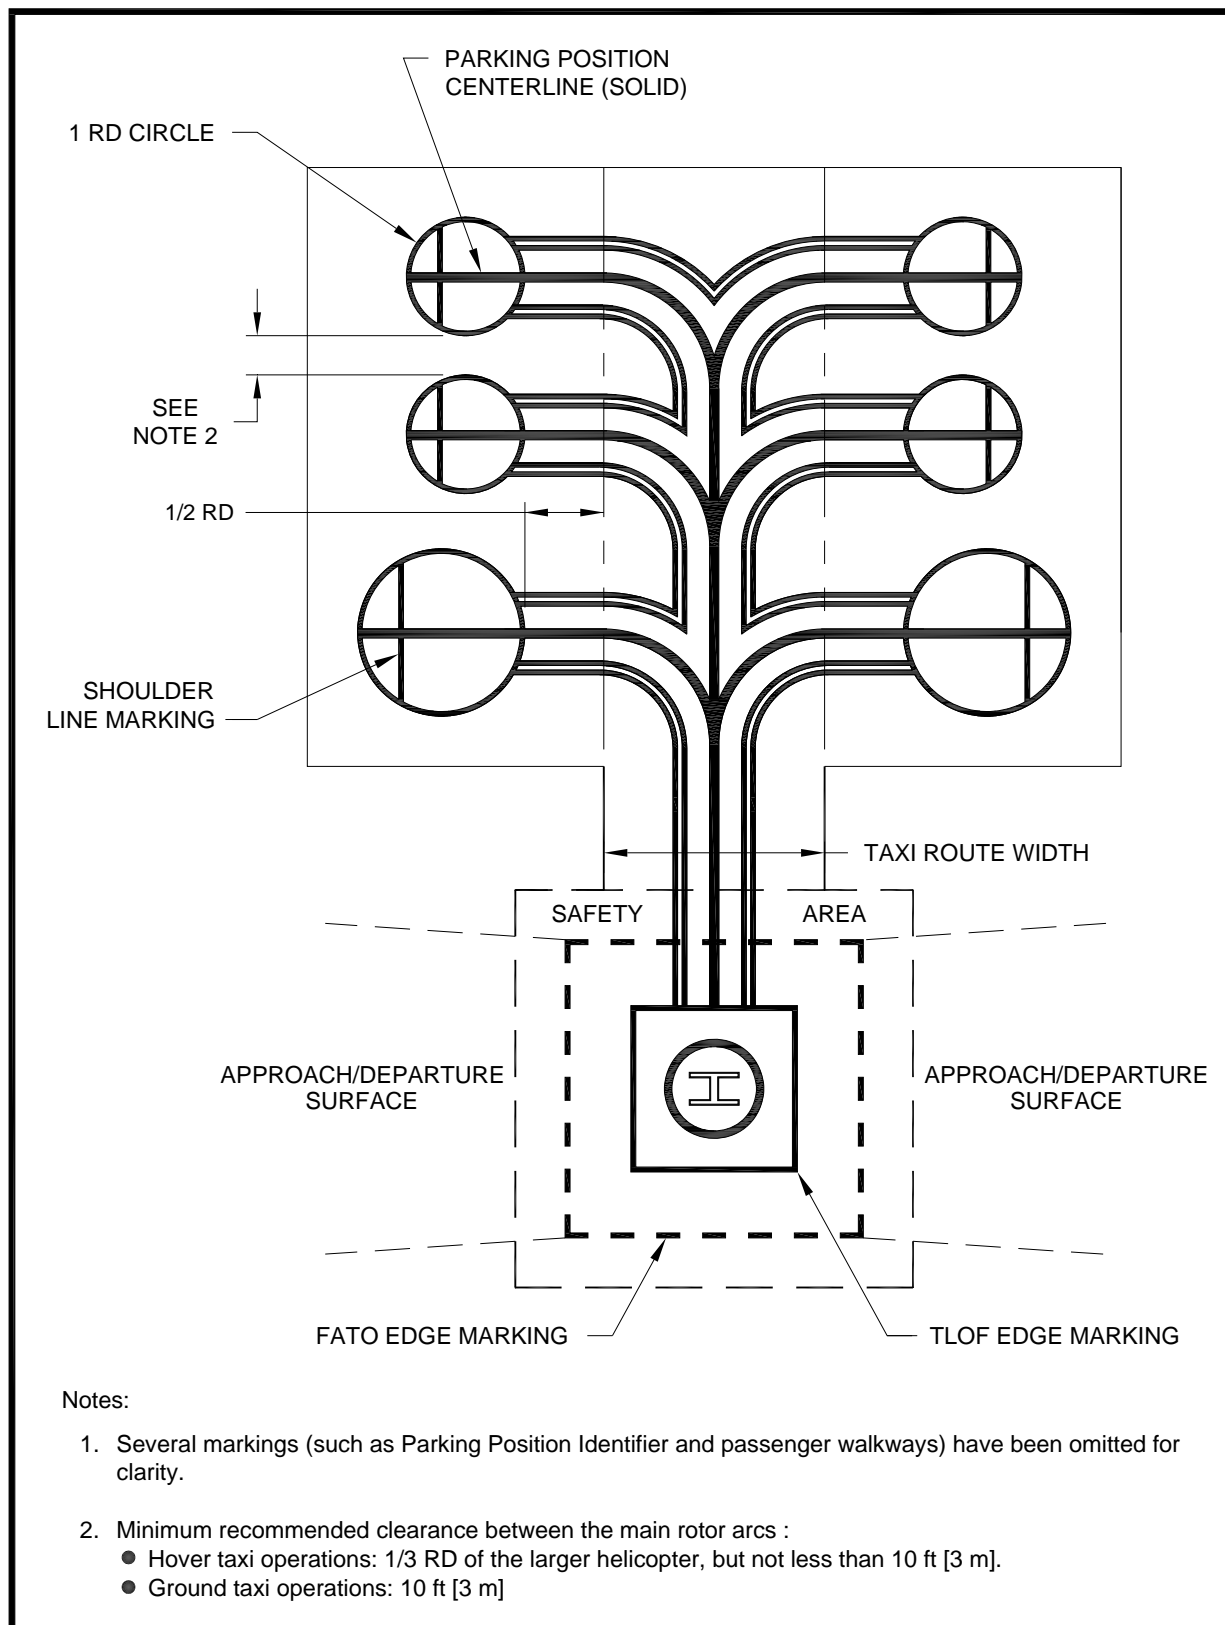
Parking Area Design – “Taxi-through” Parking Positions:
